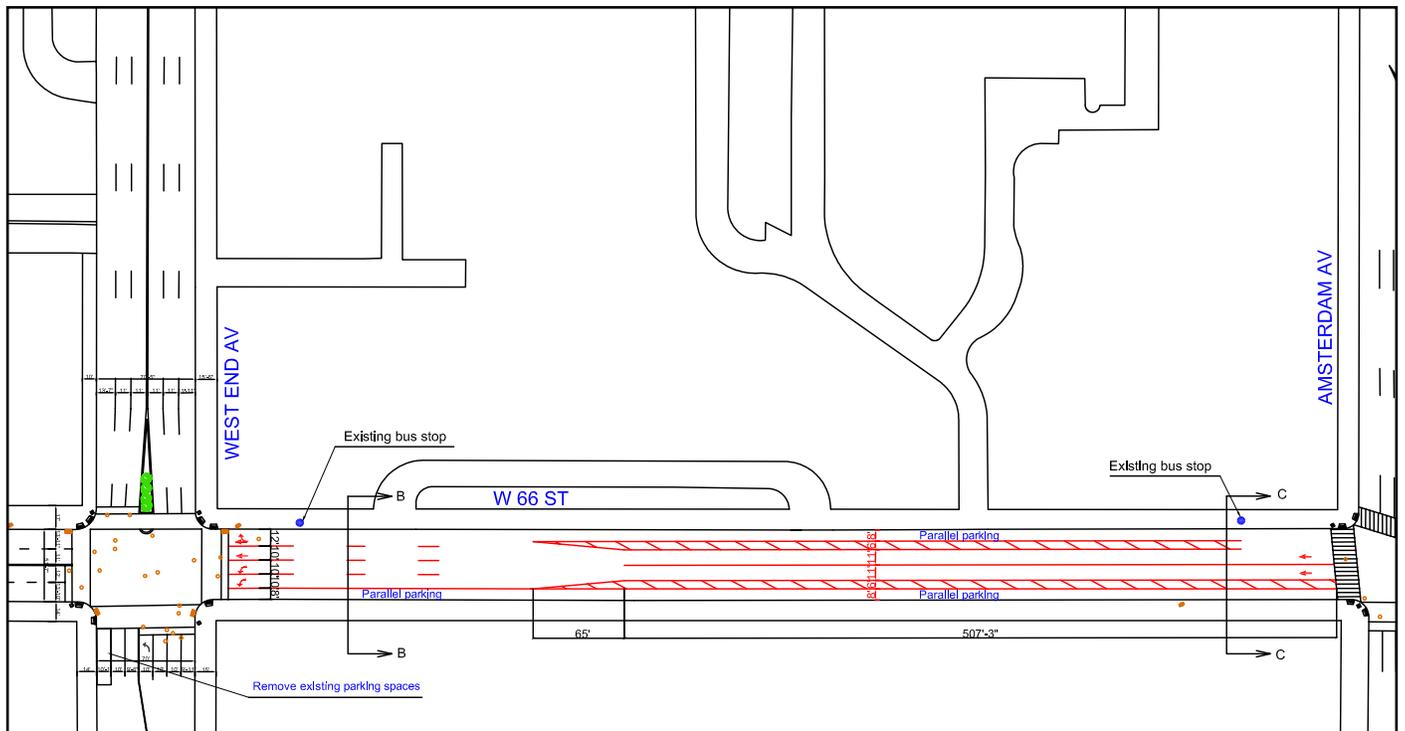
Proposed Condition on West 66th Street between Amsterdam Avenue and West End Avenue
